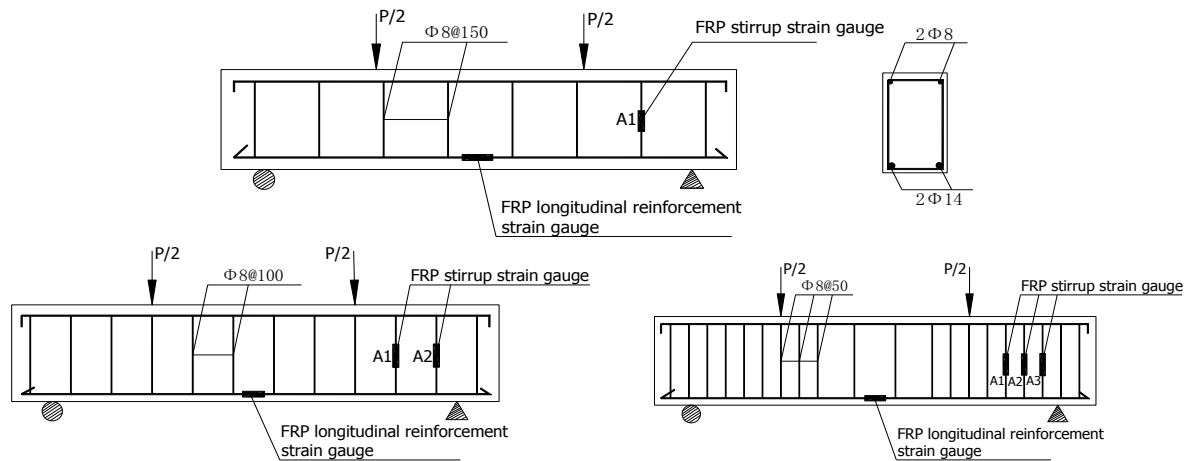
Different section reinforcement of beams with stirrups and measuring point layout
